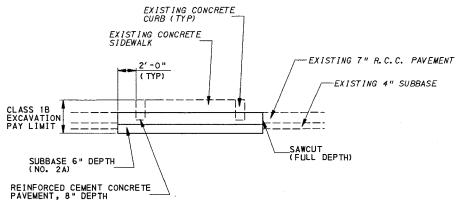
DETAIL - MON WHARF PAVEMENT REPLACEMENT
